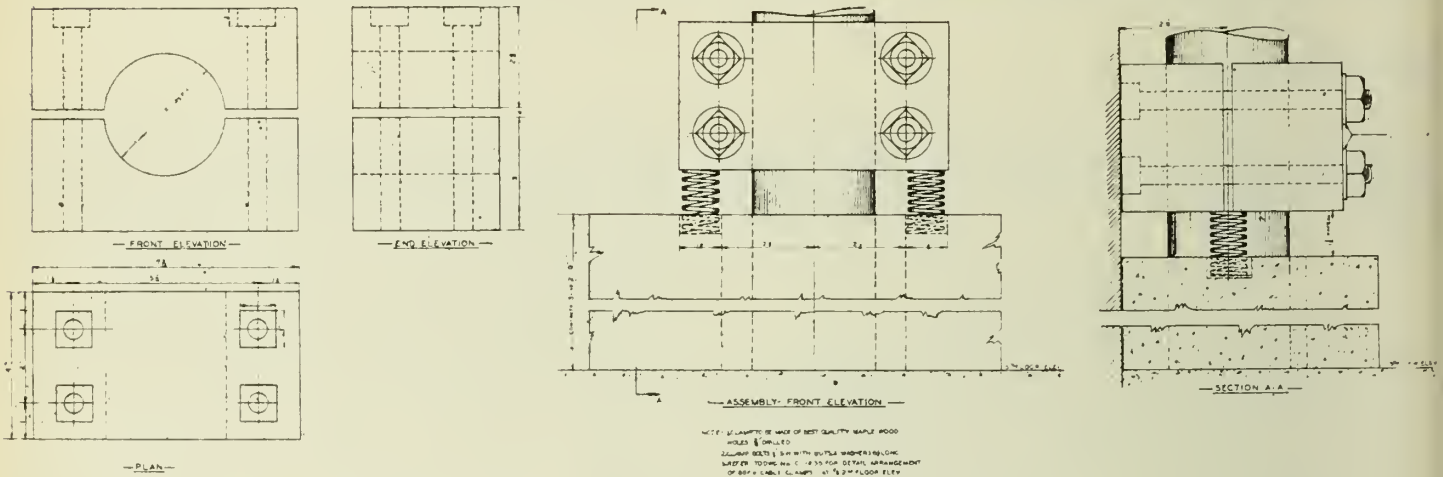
Detailed Arrangement of 66-kv. Cable Clamp at Fifth Floor Elevation at Station.
